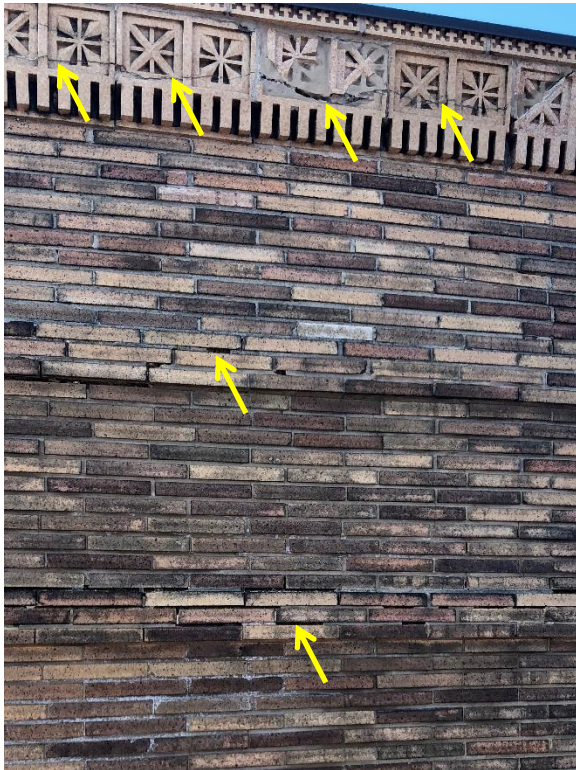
Open mortar joints in brick masonry and cracked terra cotta units (photo courtesy of FHP)
